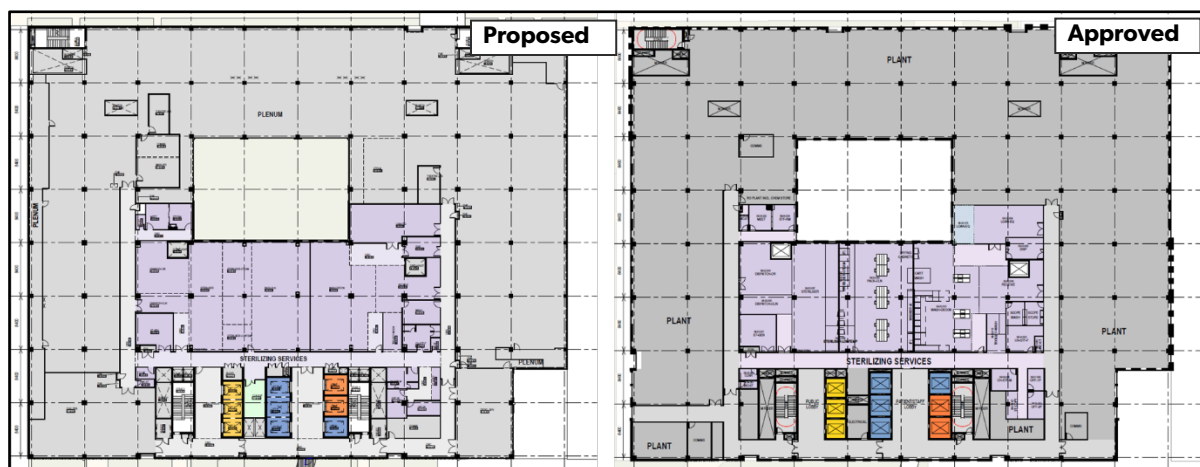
| Proposed (left) and approved (right) Level 4 floor plan (Source: Modification Application)
